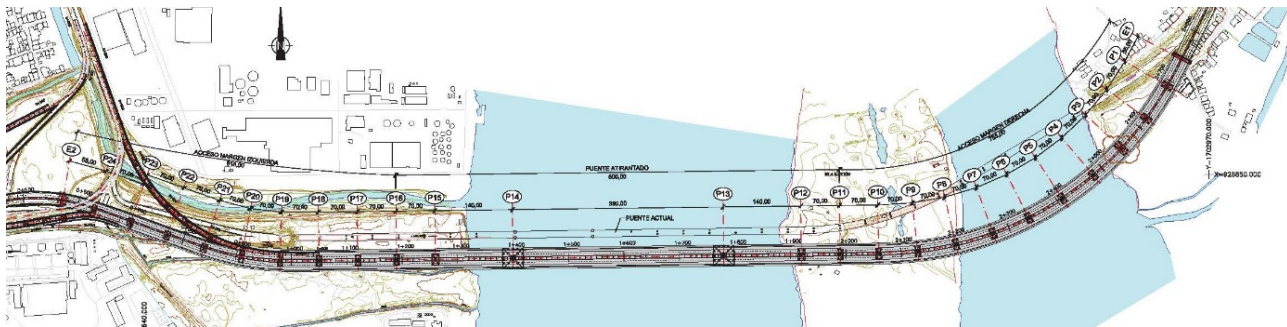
Plan view of the structure of the New Pumarejo Bridge
